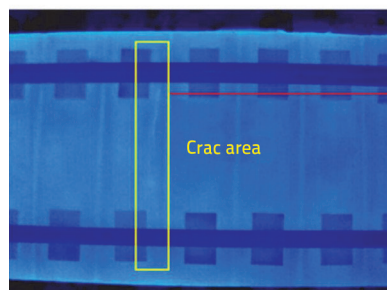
ICT damage testing of the railway concrete slab [93]
